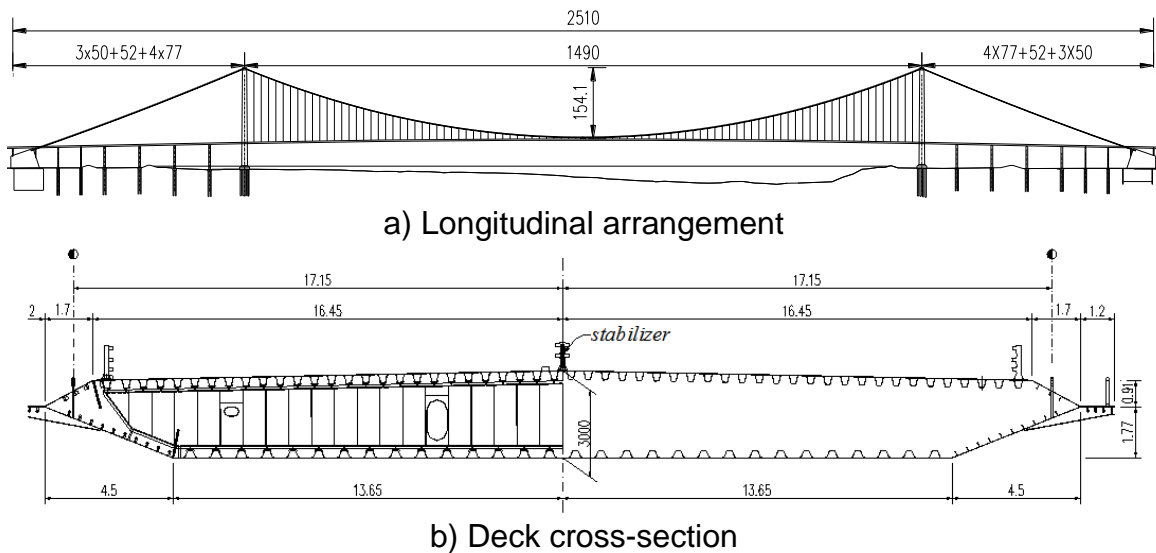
Runyang Bridge across Yangtze River (Unit: m)
